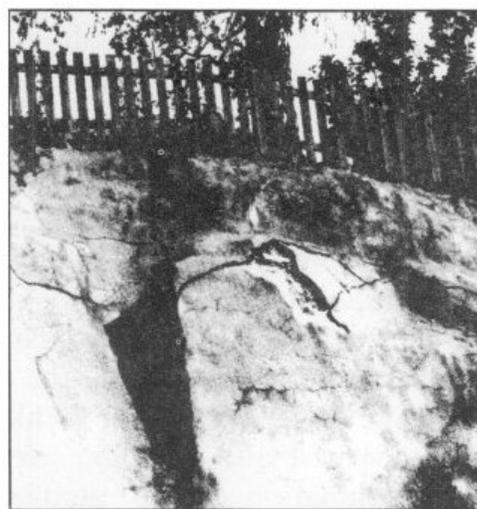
Shotcrete failure in an open cutting due to frost burst.
